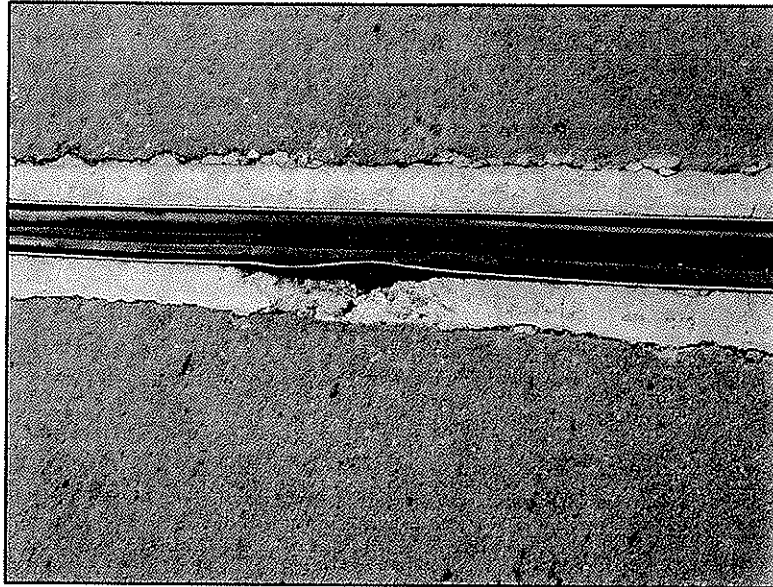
D shows damage to the expansion joint at bent 2 southbound lane, near the sidewalk. Note the bent plate and spalled grout at this location.
